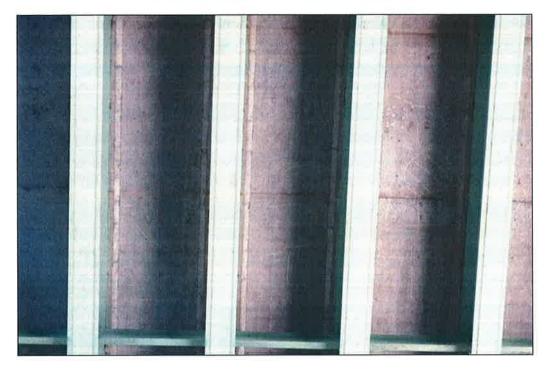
Typical Condition of Soffit (Bent 85-86) (fair condition – stained and unstained cracking, delaminations and patches)
